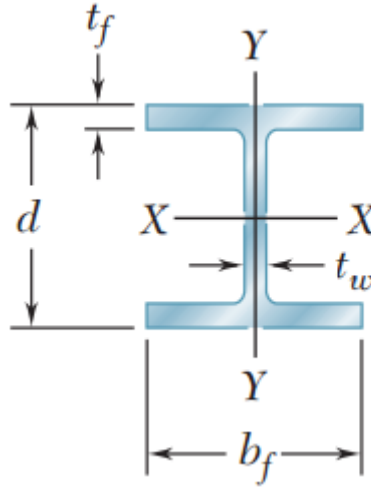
Cross section of W310×143 support structure (see Appendix A)
